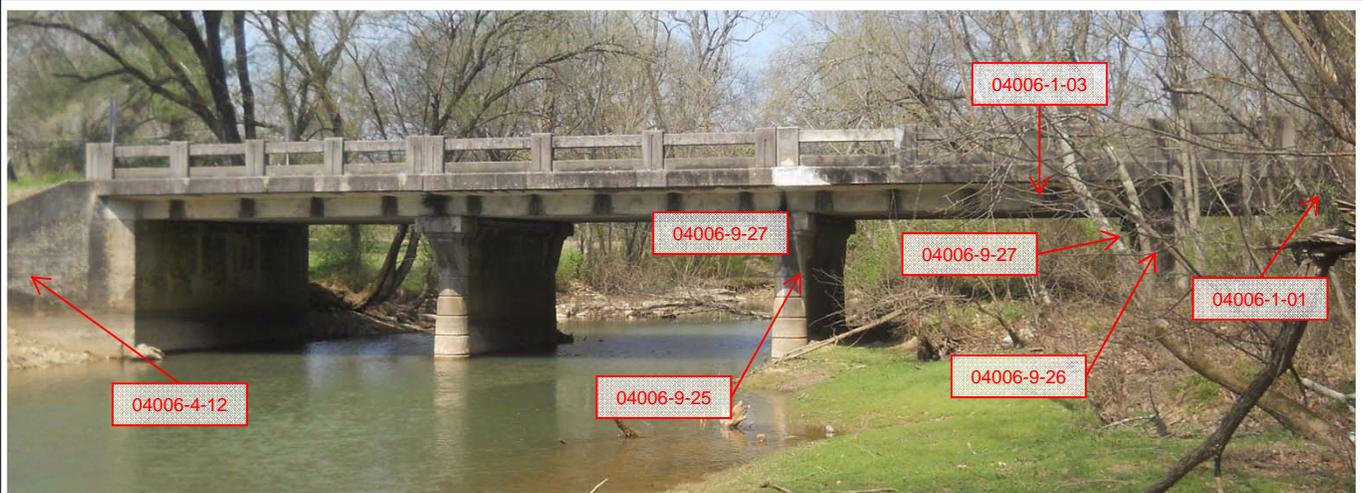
View of bridge looking west from bank of Little Richland Creek.
